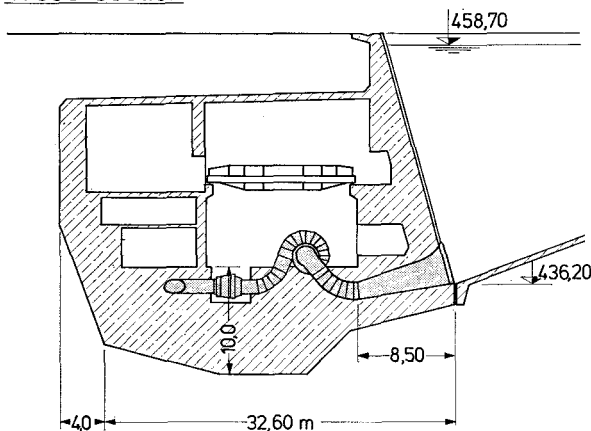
Pumping storage plant. Expansion joints are avoided by prestressing.
